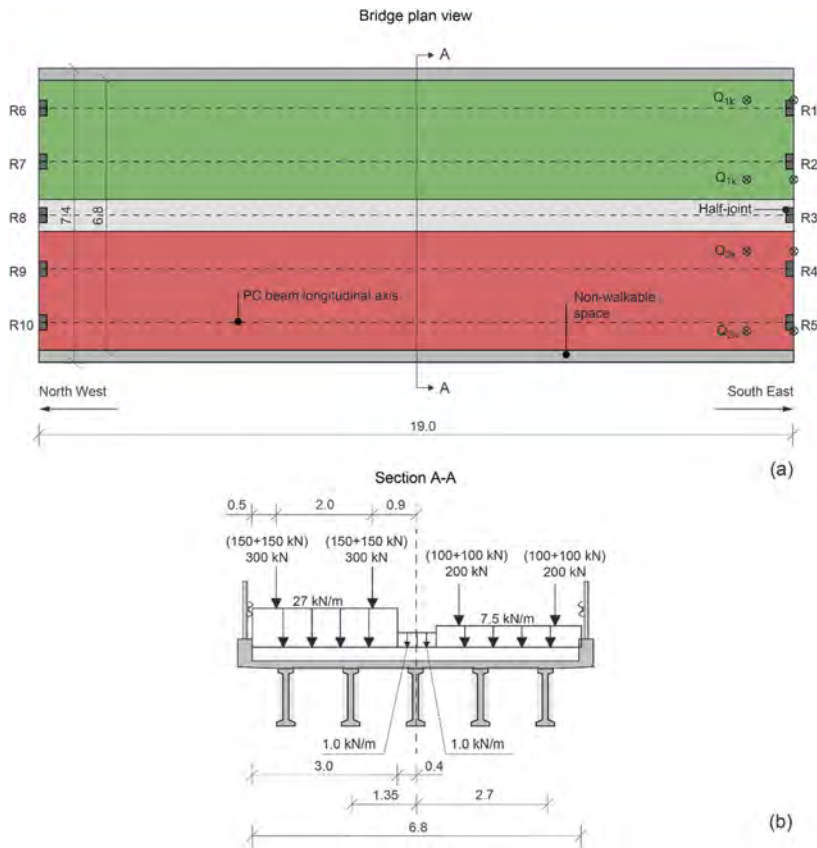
Loads on the central suspended span according to NTC 2018 (Infrastructure Ministerial Decree 2018): (a) plan view and (b) vertical cross-section.
